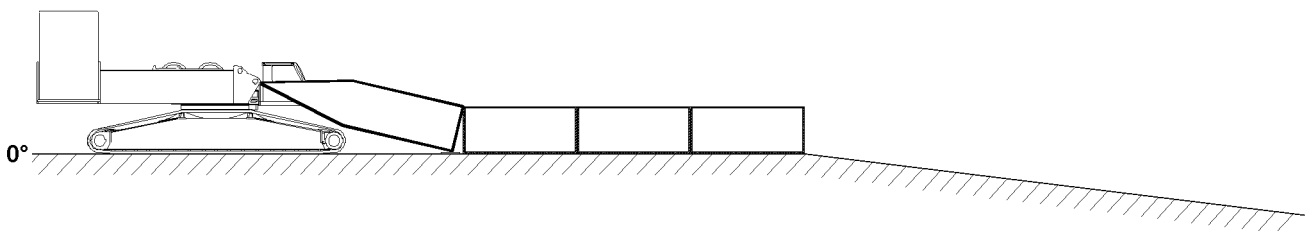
Disassemble and remove the boom - intermediate sections with the end section
